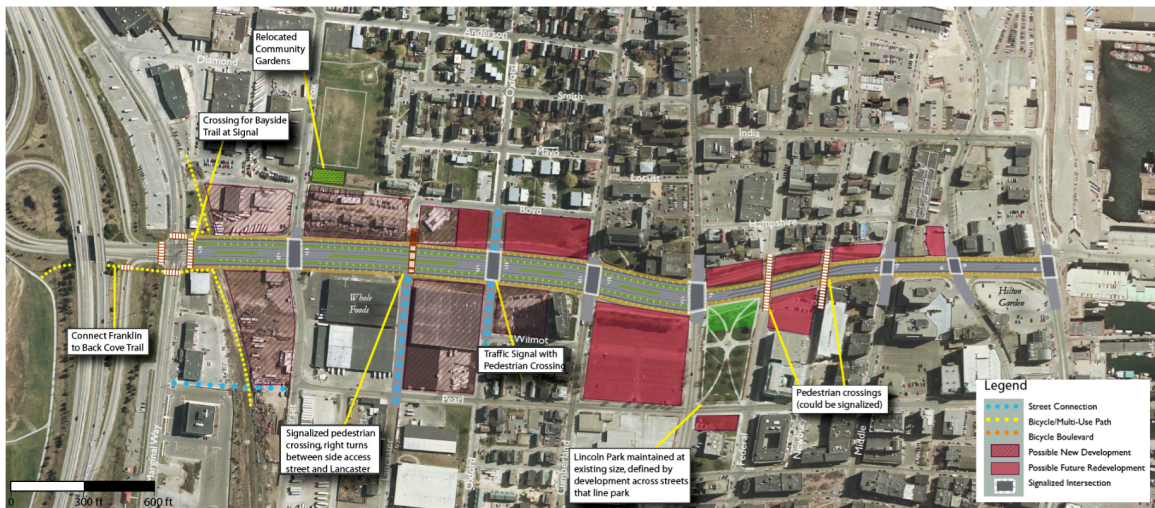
Multiway Boulevard Design (Franklin Street Arterial Study Committee, 2009)
